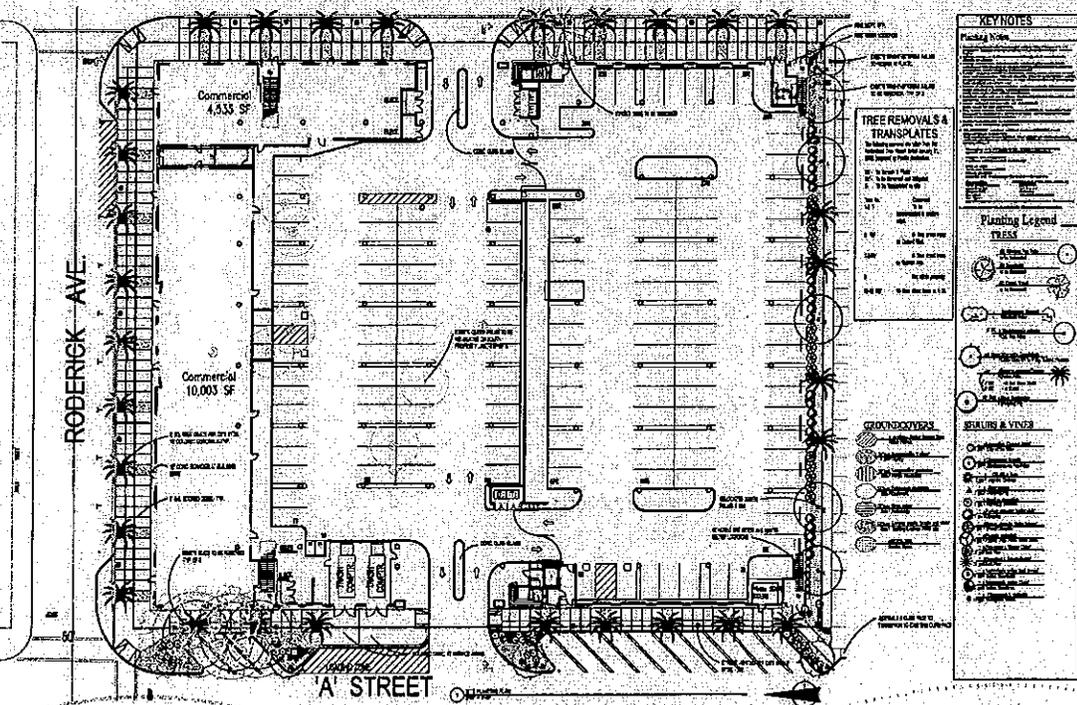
TO LOAN AGREEMENT PROJECT SITE PLAN
